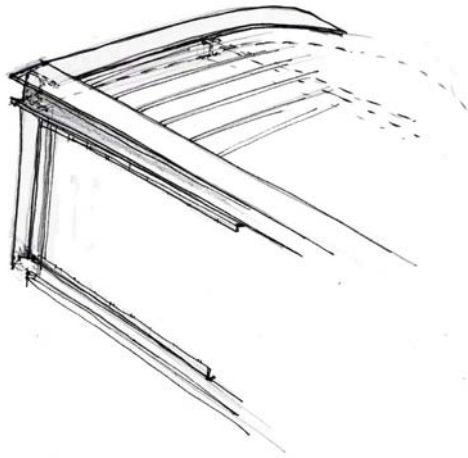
Fixing of IBR sheeting to main steel structure. View from outside
